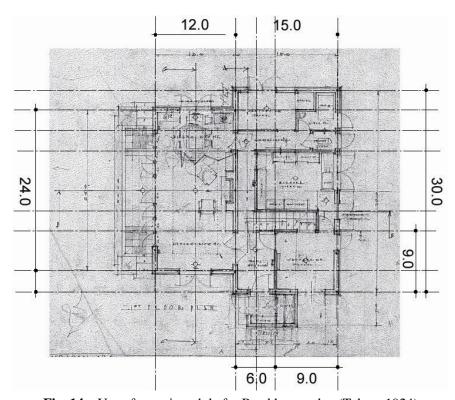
Use of tatami module for Read house plan (Tokyo, 1924)
